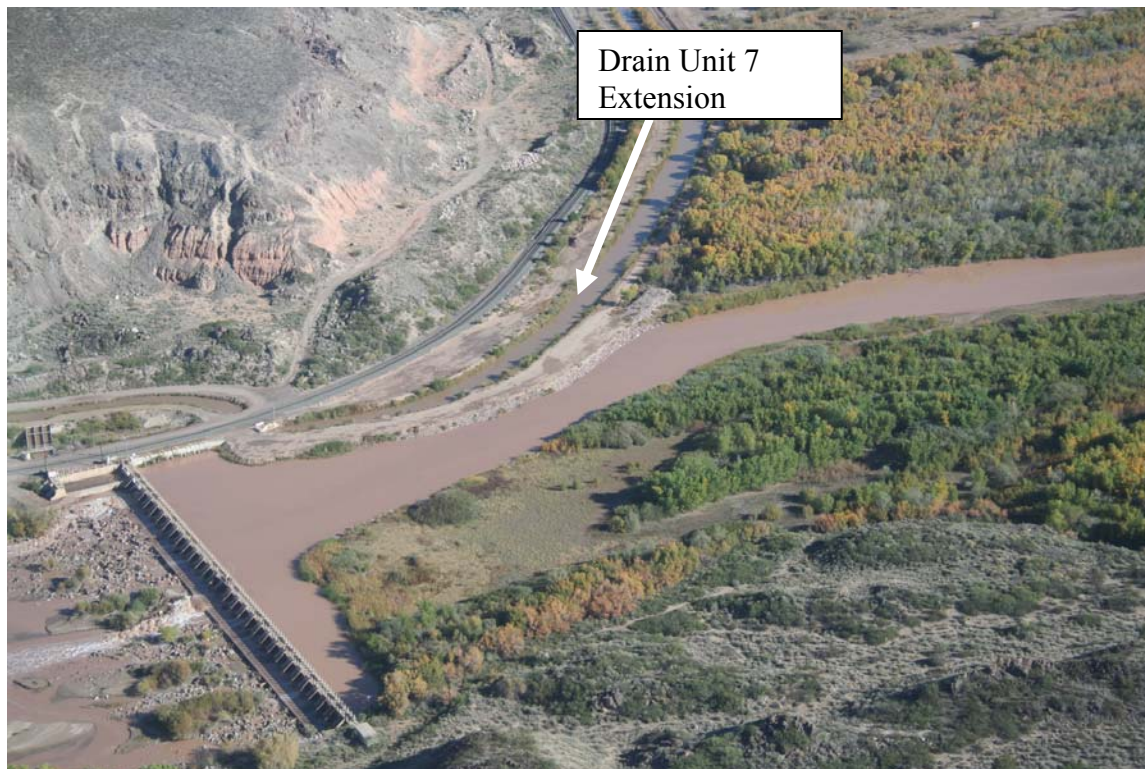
Completed Drain Unit 7 Extension priority site, looking north, with San Acacia Diversion Dam at lower left (October 2009, Gonzales)
